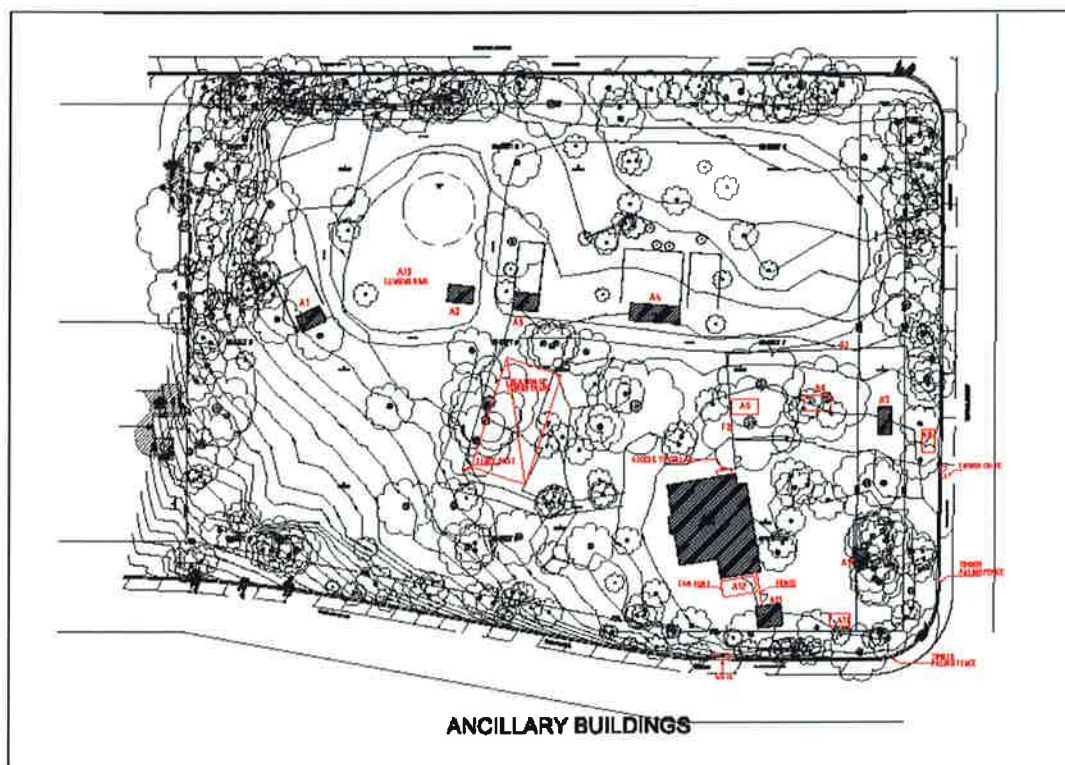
Site survey showing ancillary buildings and fences, n.d.
